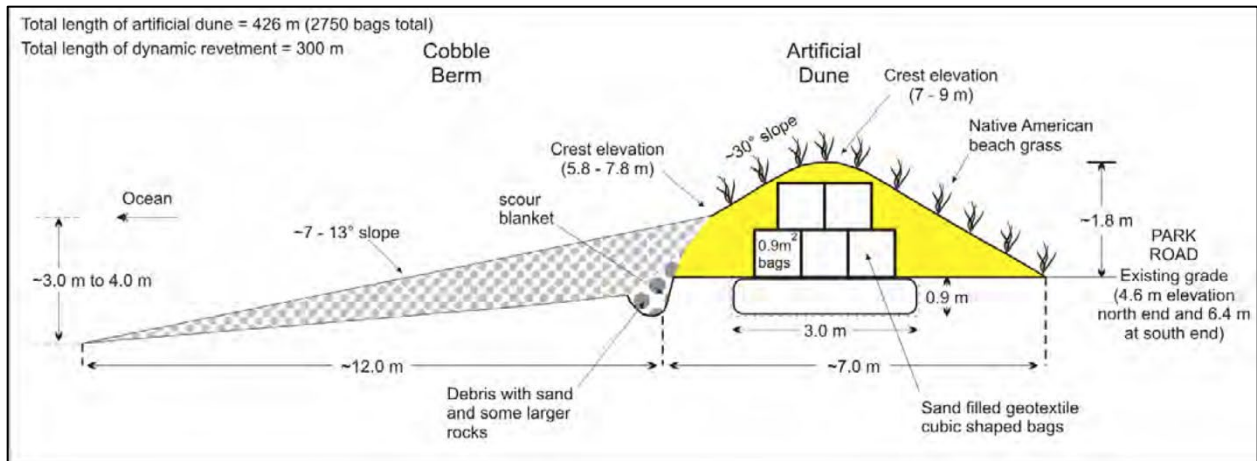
Cross-section of proposed Cape Lookout State Park cobble berm and dune (from Komar and Allan, 2009).
